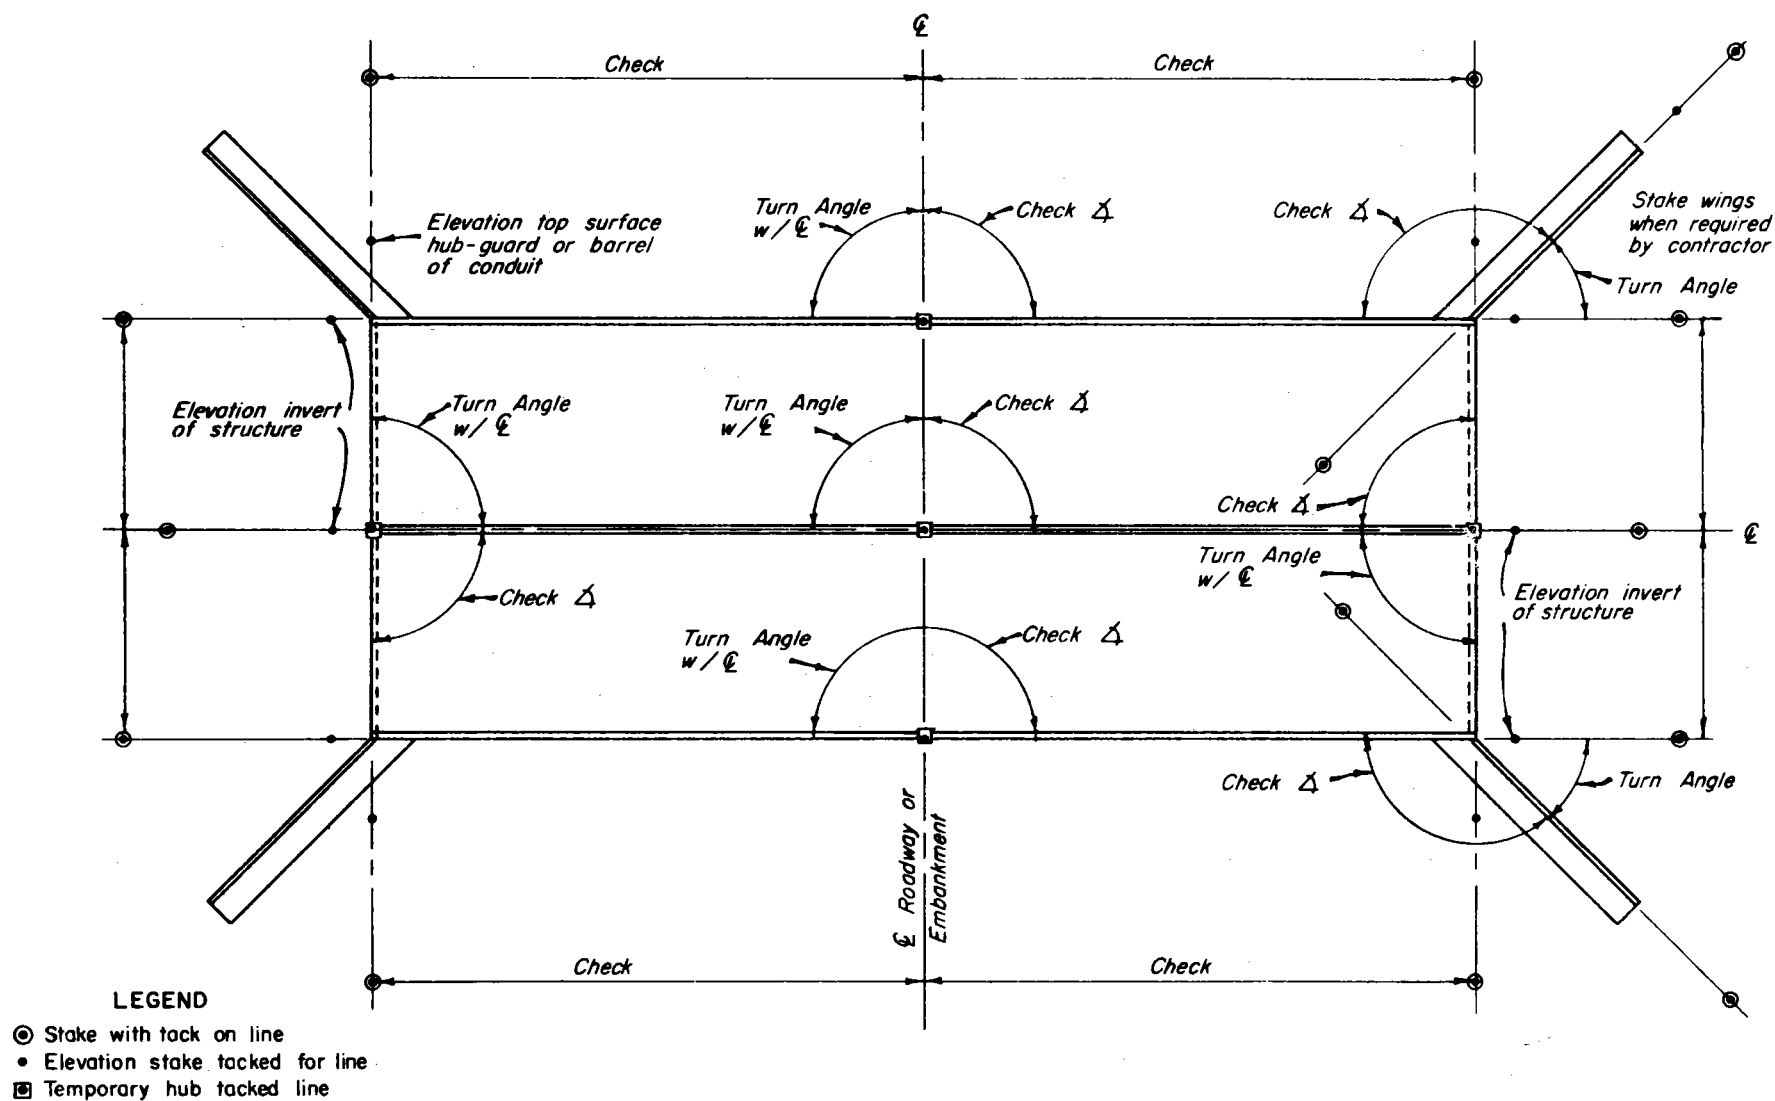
EXAMPLE FOR STAKING MULTIPLE BOX CONDUITS
